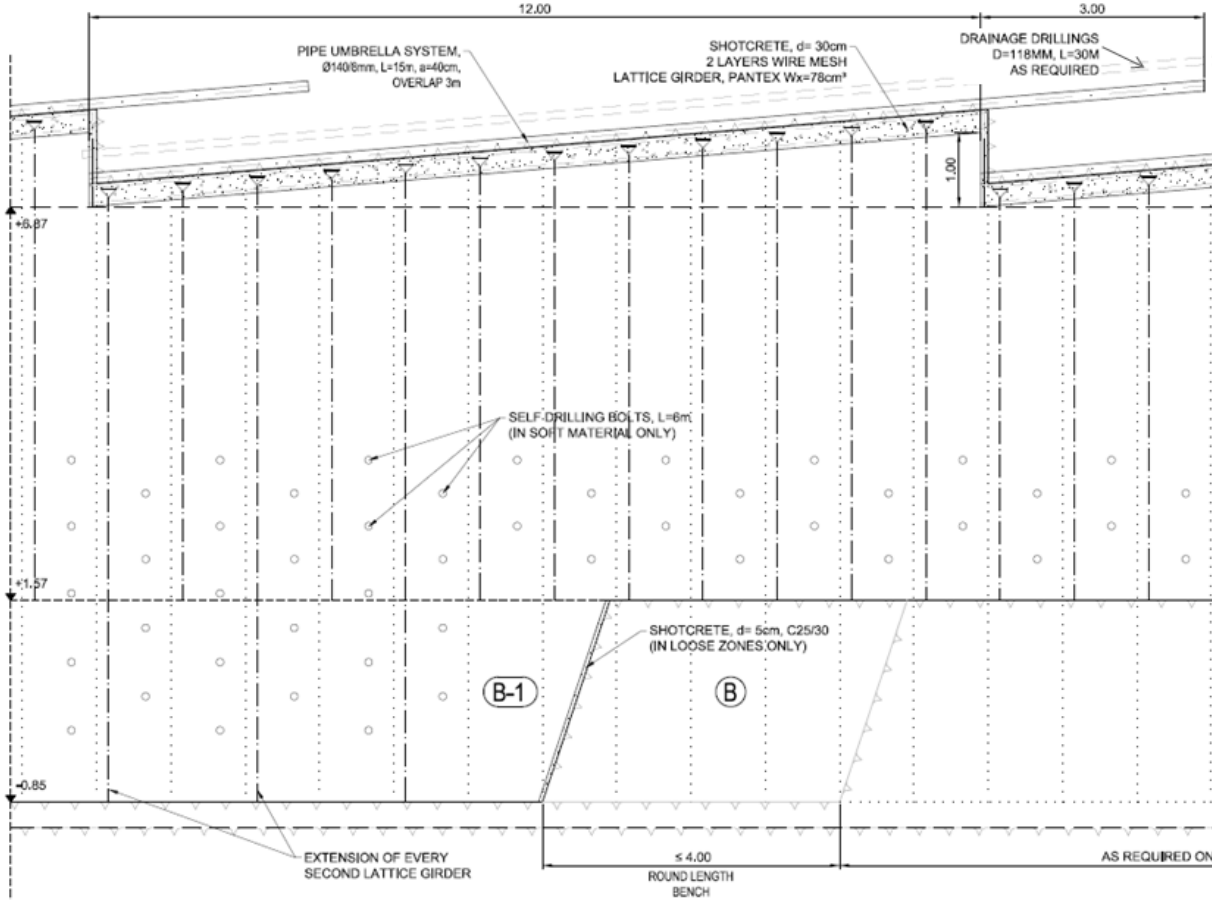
A section of the conceptual design of the longitudinal section of Joberet soil tunnel showing a pipe umbrella system with 15 m long pipes and an overlap of 3 m (iC-Consulenten, 2013).
